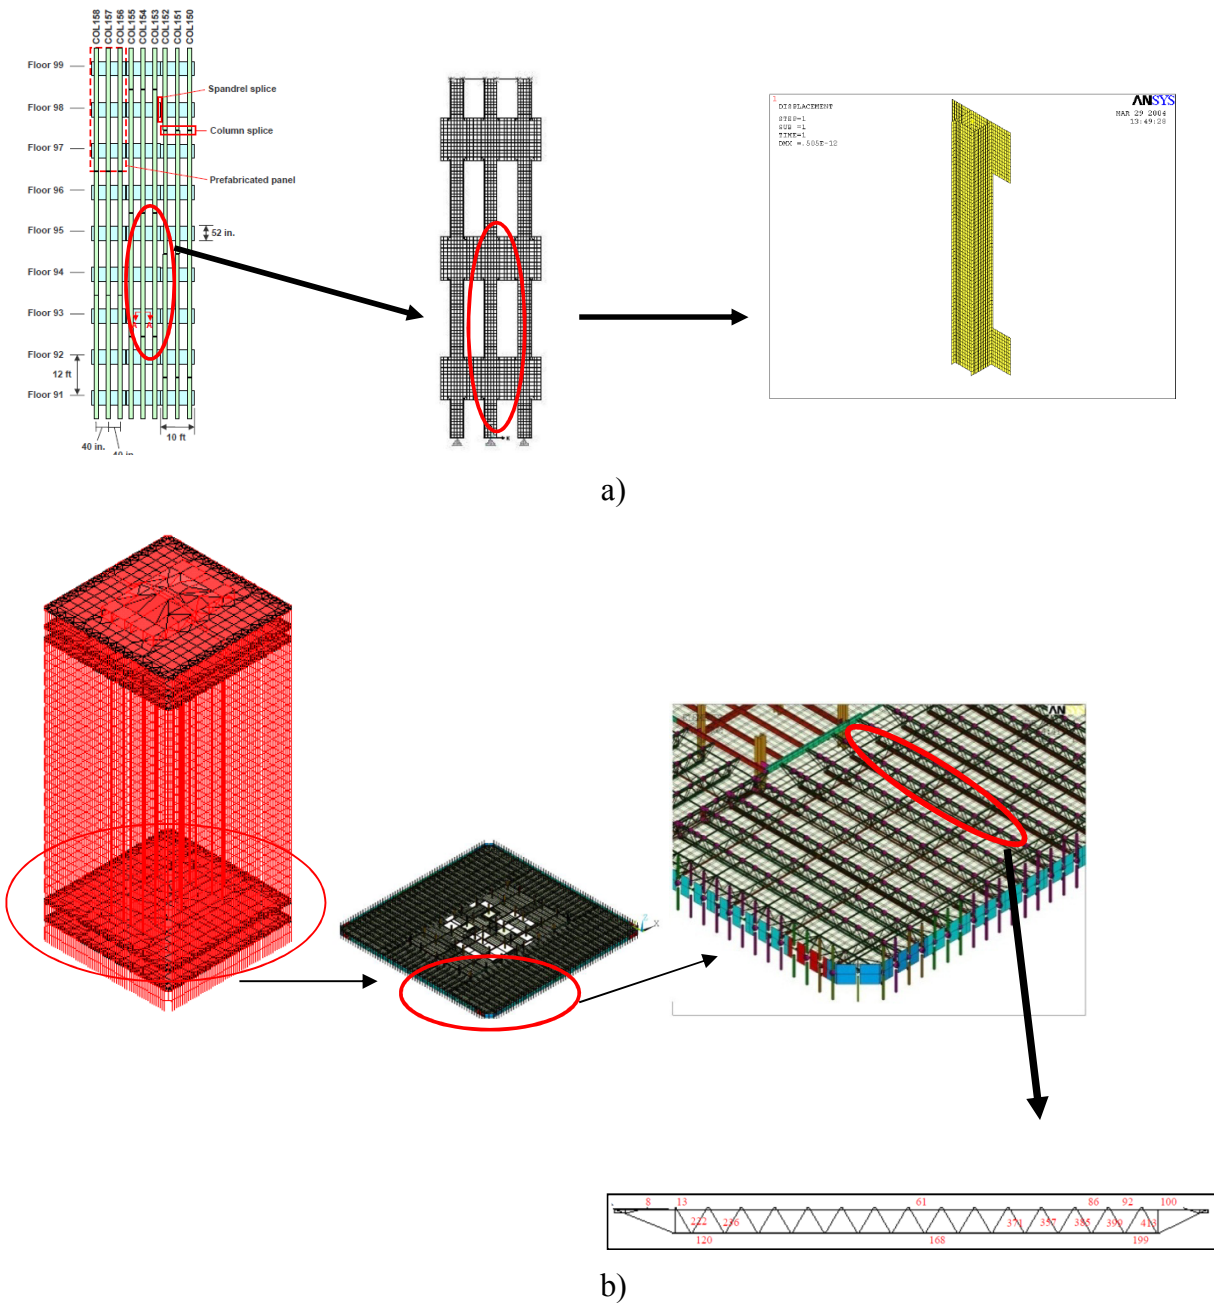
a) Exterior wall subsystem b) Floor Subsystem (NIST NCSTAR 1-6 Draft, Executive summary)
